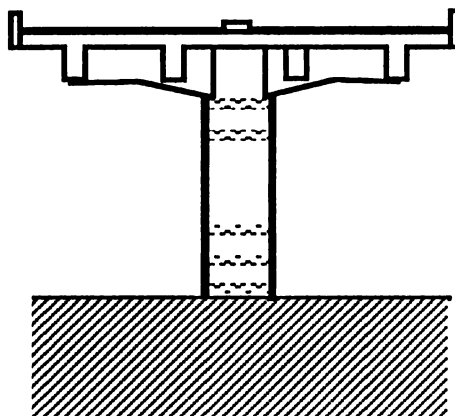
Sketch of parallel cracks due to impulsive forces in bridge R/C pier
